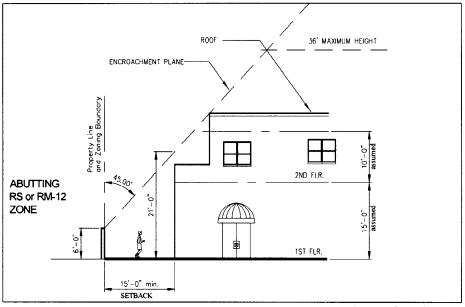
Encroachment plane requirements for projects abutting RS and RM-12 districts
